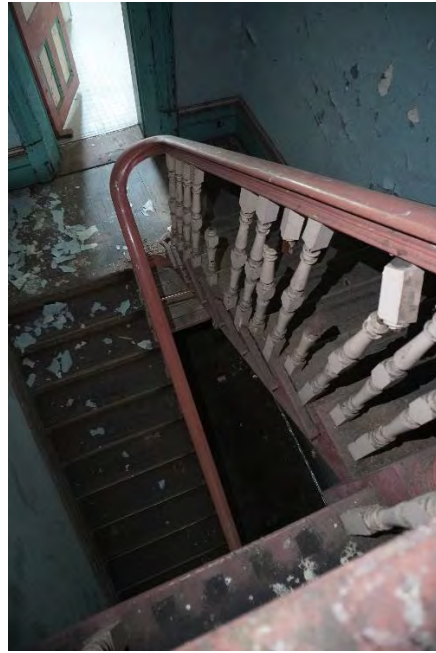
View of stairs within the CME Building from first floor looking down onto the ground floor with the toilets located between the two (Source: Curio 2021)
